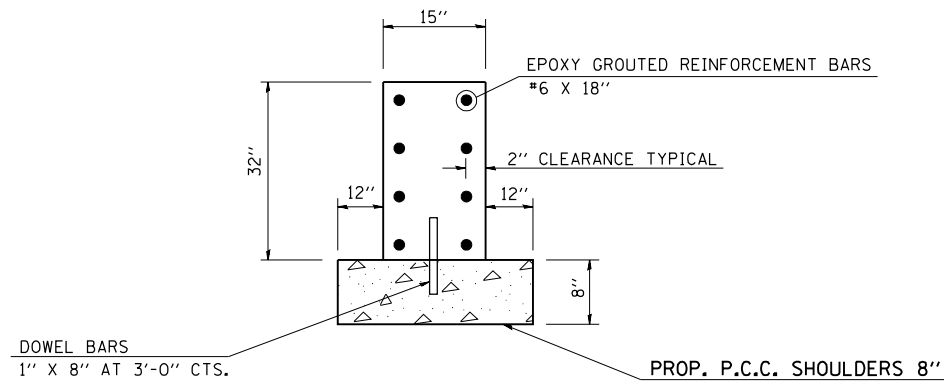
# DETAIL: CONCRETE BARRIER SINGLE FACE, (SPECIAL)
